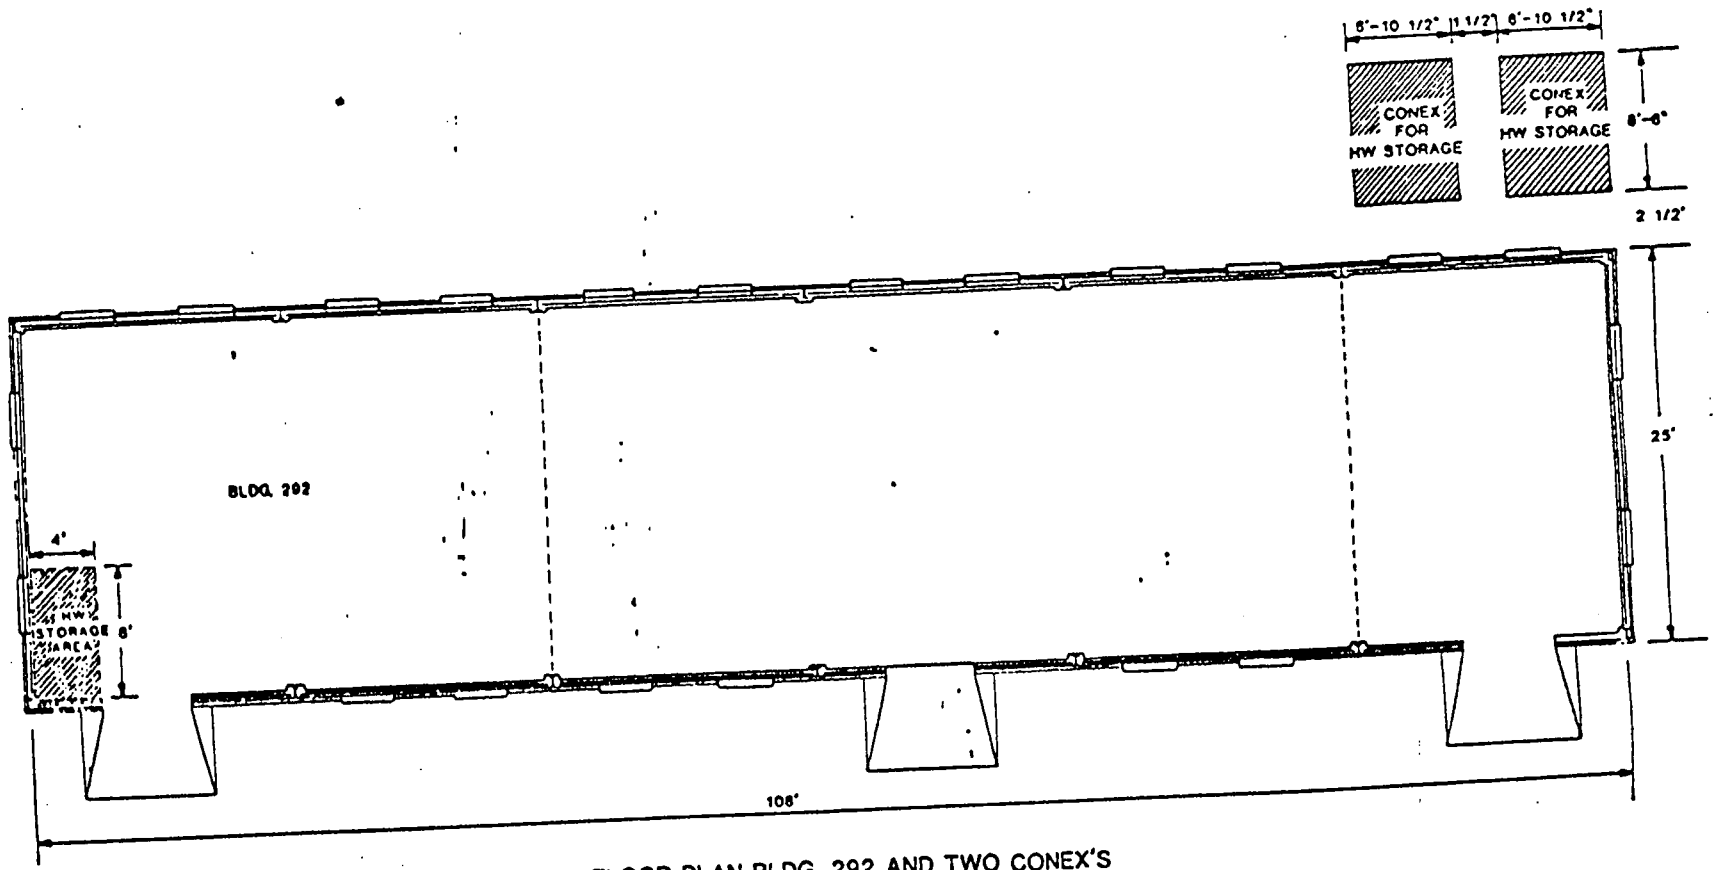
FLOOR PLAN BLDG. 292 AND TWO CONEX'S
